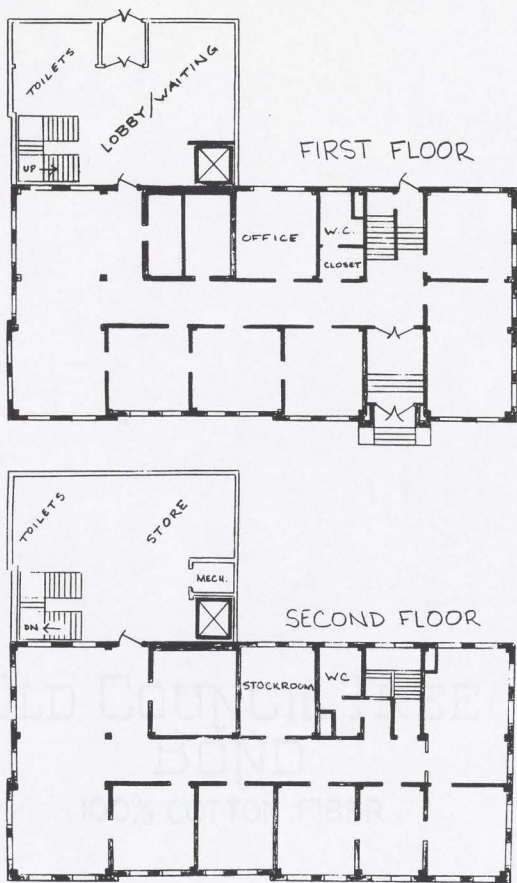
Museum conceptual plan 2 (addition housing all new facilities).
